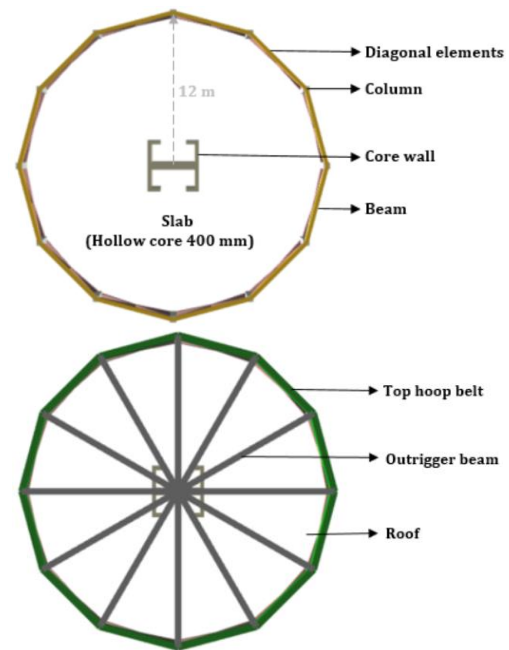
Floor plan of the typical floor (top) and roof (bottom) of the case study building
